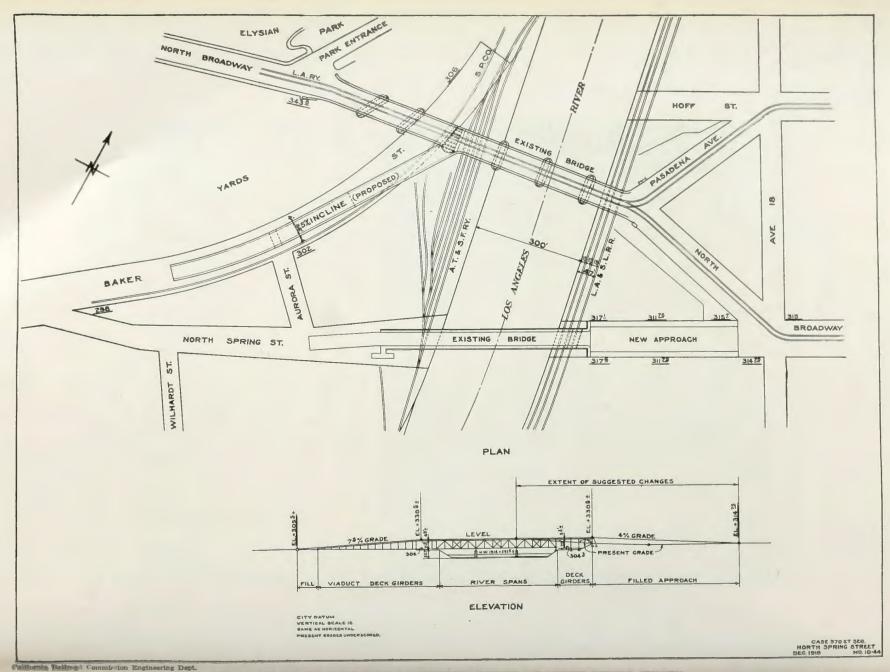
PLAN AND ELEVATION OF EXISTING BRIDGE AT NORTH SPRING STREET
